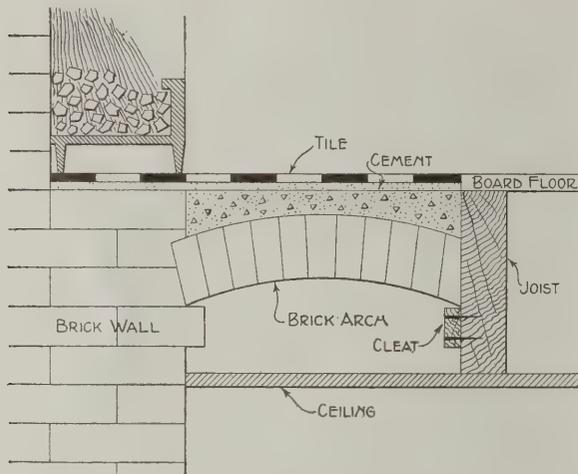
One Method of Constructing Foundation for Tile Hearth
